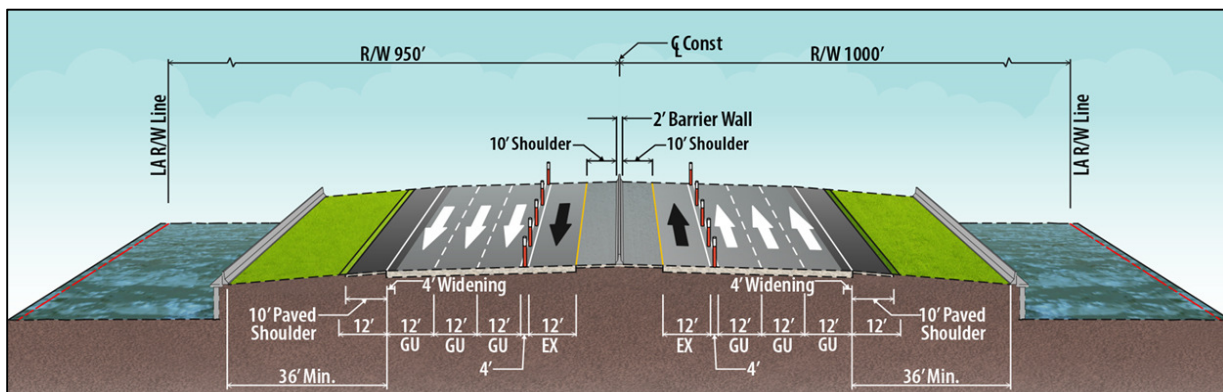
I-275 Mainline Starter Project Build Alternative Typical Section from north of 4th Street North to 1.0 mile south of the Howard Frankland Bridge (Segment C-SP4)
